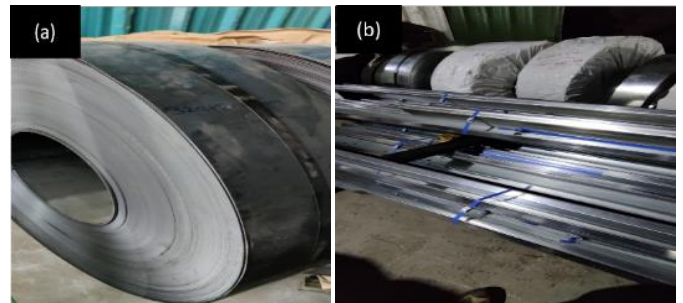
(a) Coil of cold form steel (b) specimens made from sheets.
